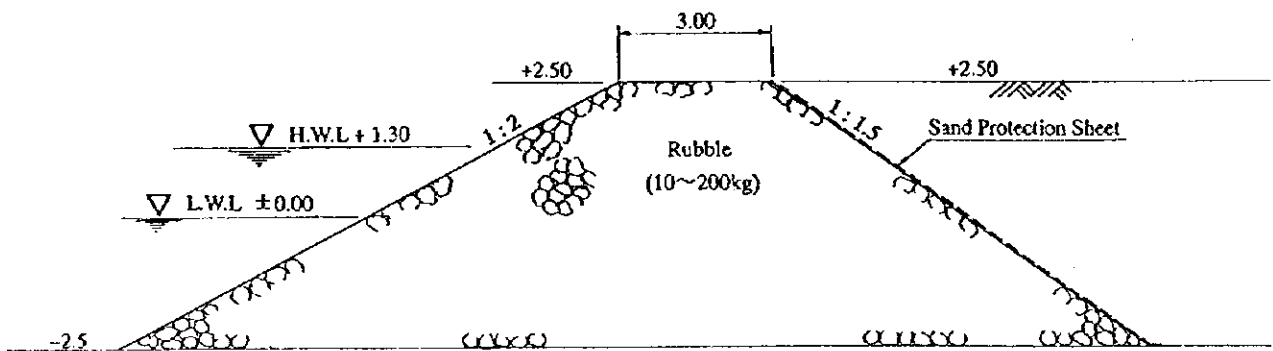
(2) Typical Cross Section of Revetment 2 (Rubble)
